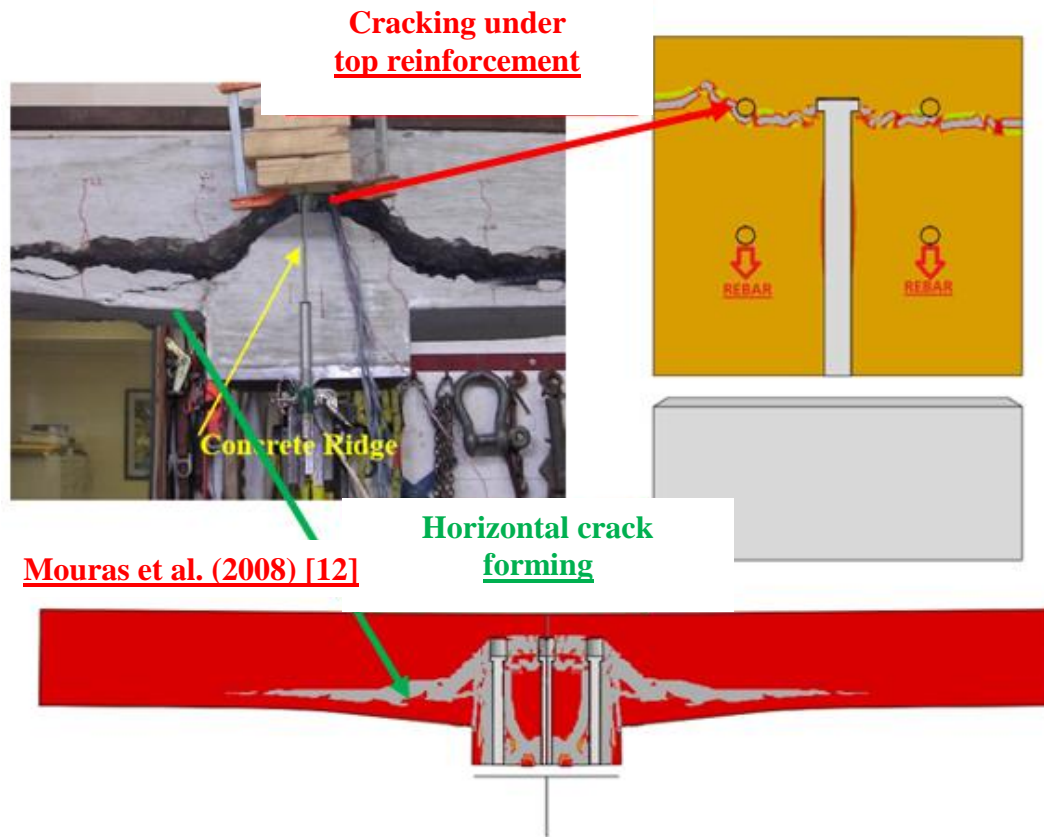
Concrete break-out failure mechanism under stud pulling and flexure (9 inch stud)
